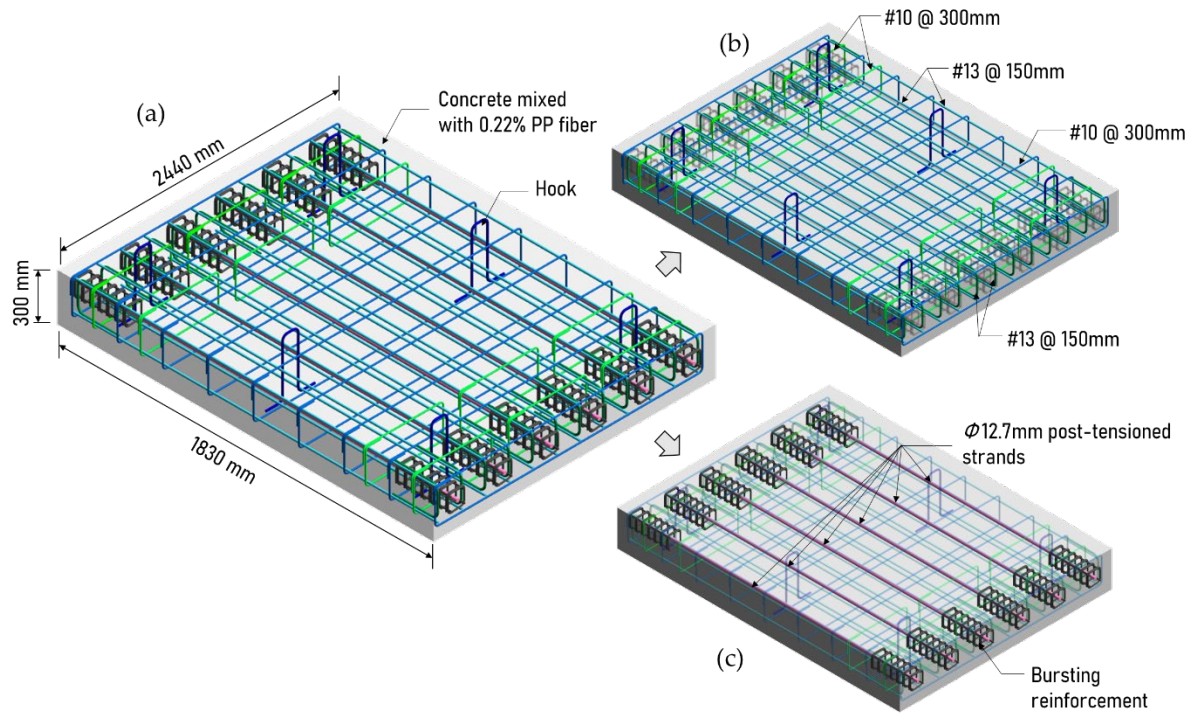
(a) Dimension, (b) reinforcement, and (c) unbonded prestressing details of TS 1 and TS 3
